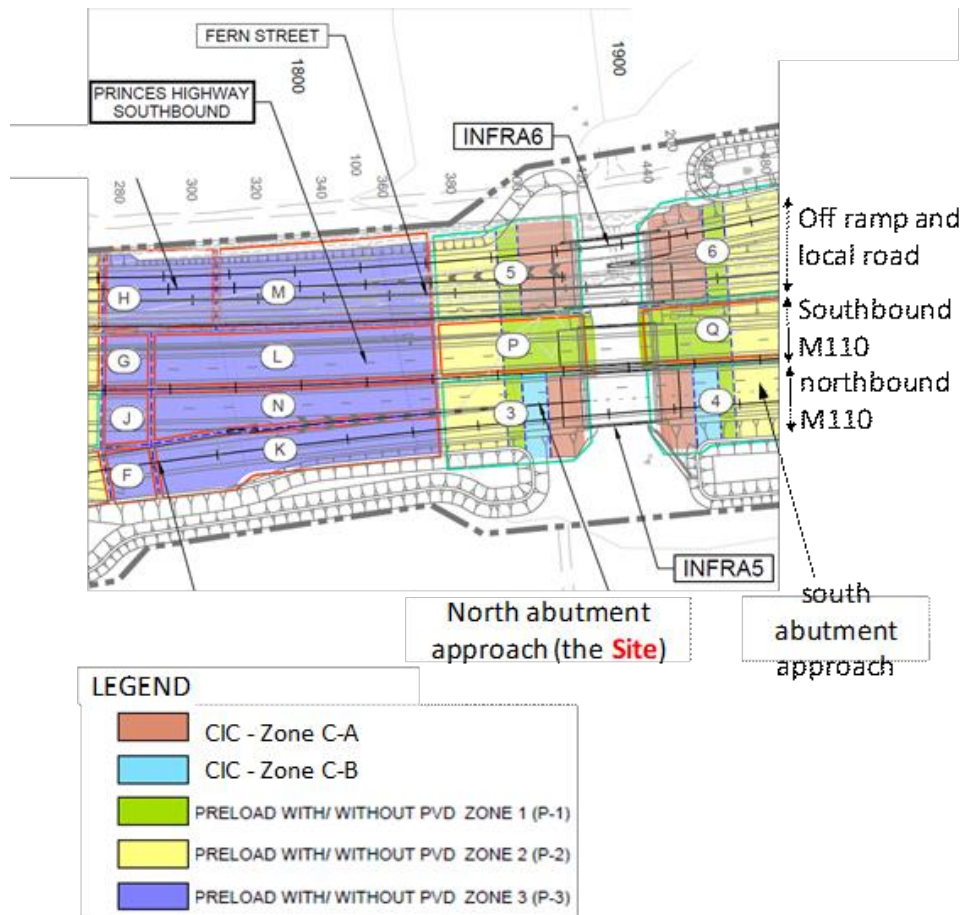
Ground improvement zones for the northbound bridge abutment approach leading to the north abutment of the Infra 5 bridge.
